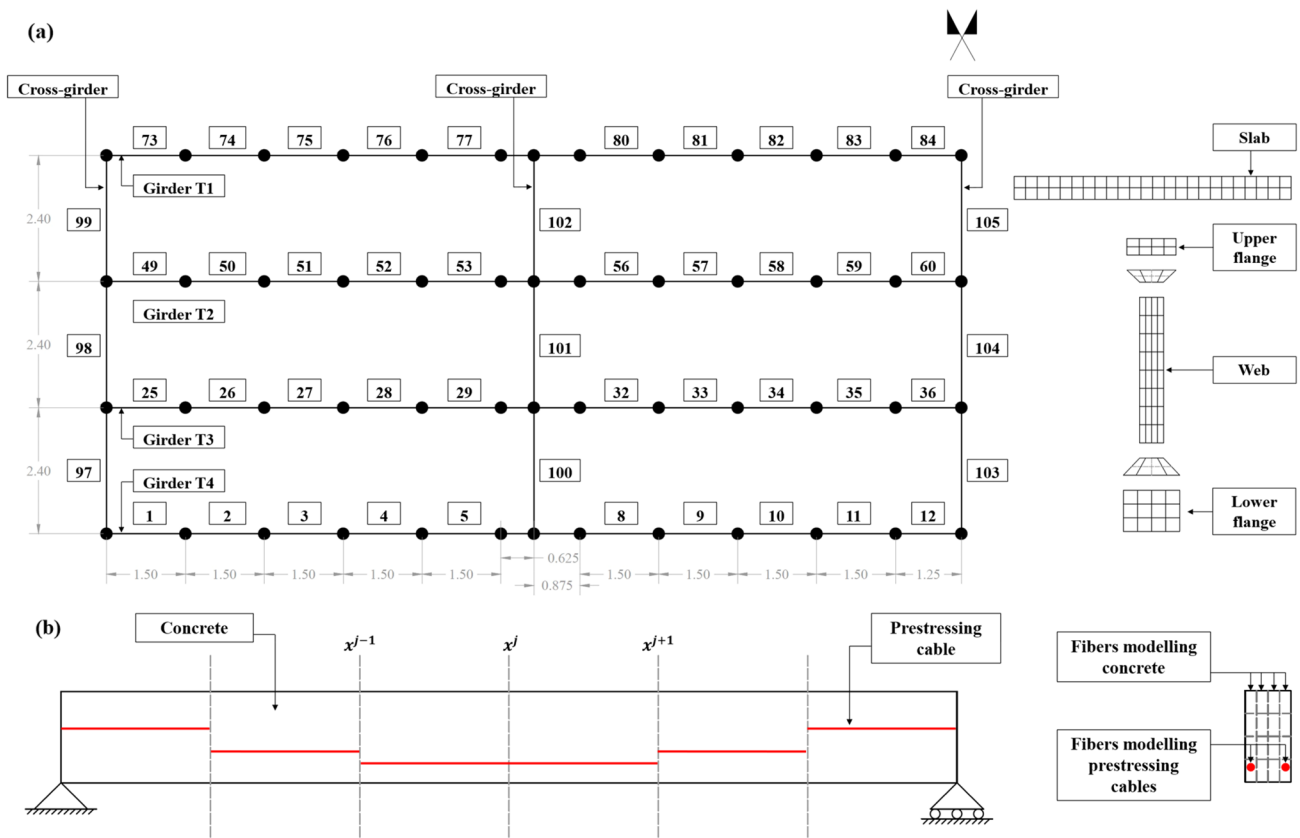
a Discretisation of (a) the bridge span and girders and b the prestressing cables in frame finite elements with fibre section
